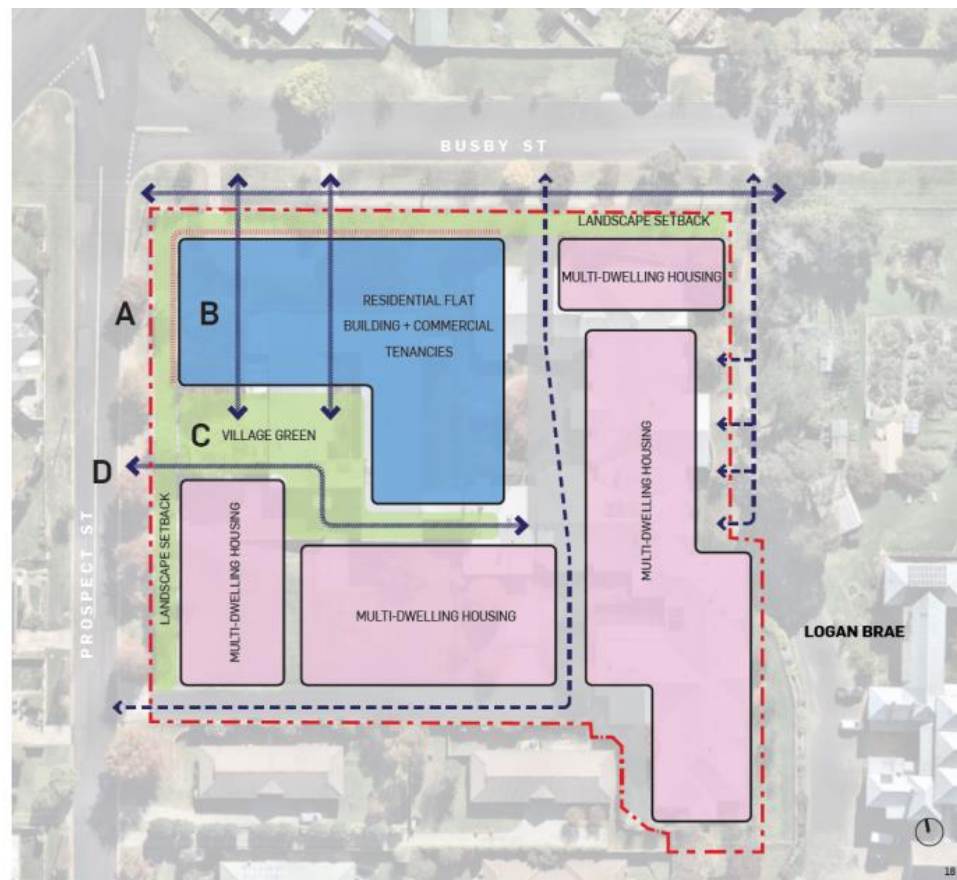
Concept Plan (Urban Design Report, Jan 2024, Allera & ClarkeHopkinsClarke)
